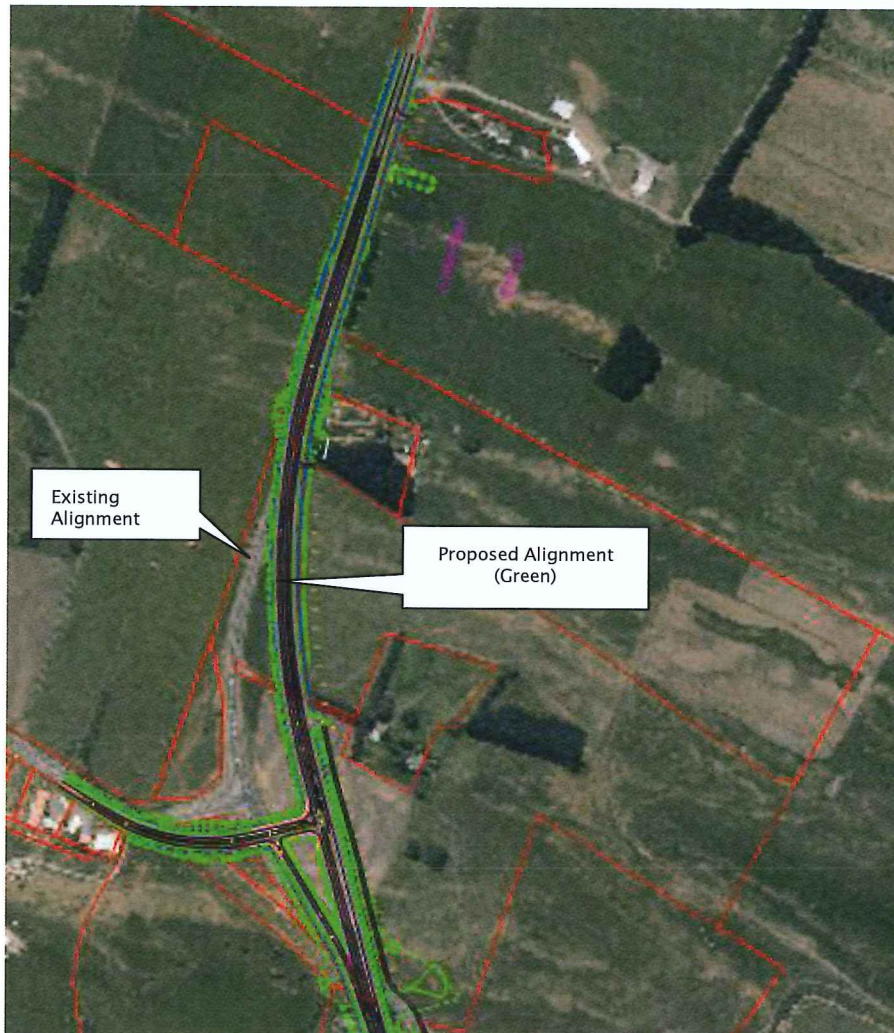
Project area north of Waitarere Beach Rd Intersection
